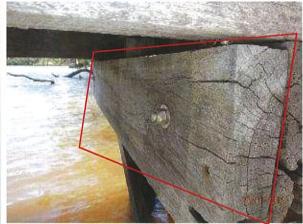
Poor connection of timber stringer to pier, with split in timber at location of metal screws.
